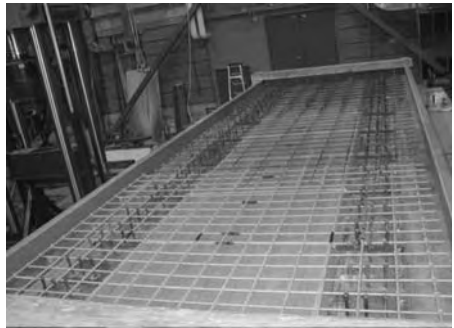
(b). Reinforcement detail of the deck slab and formwork.
